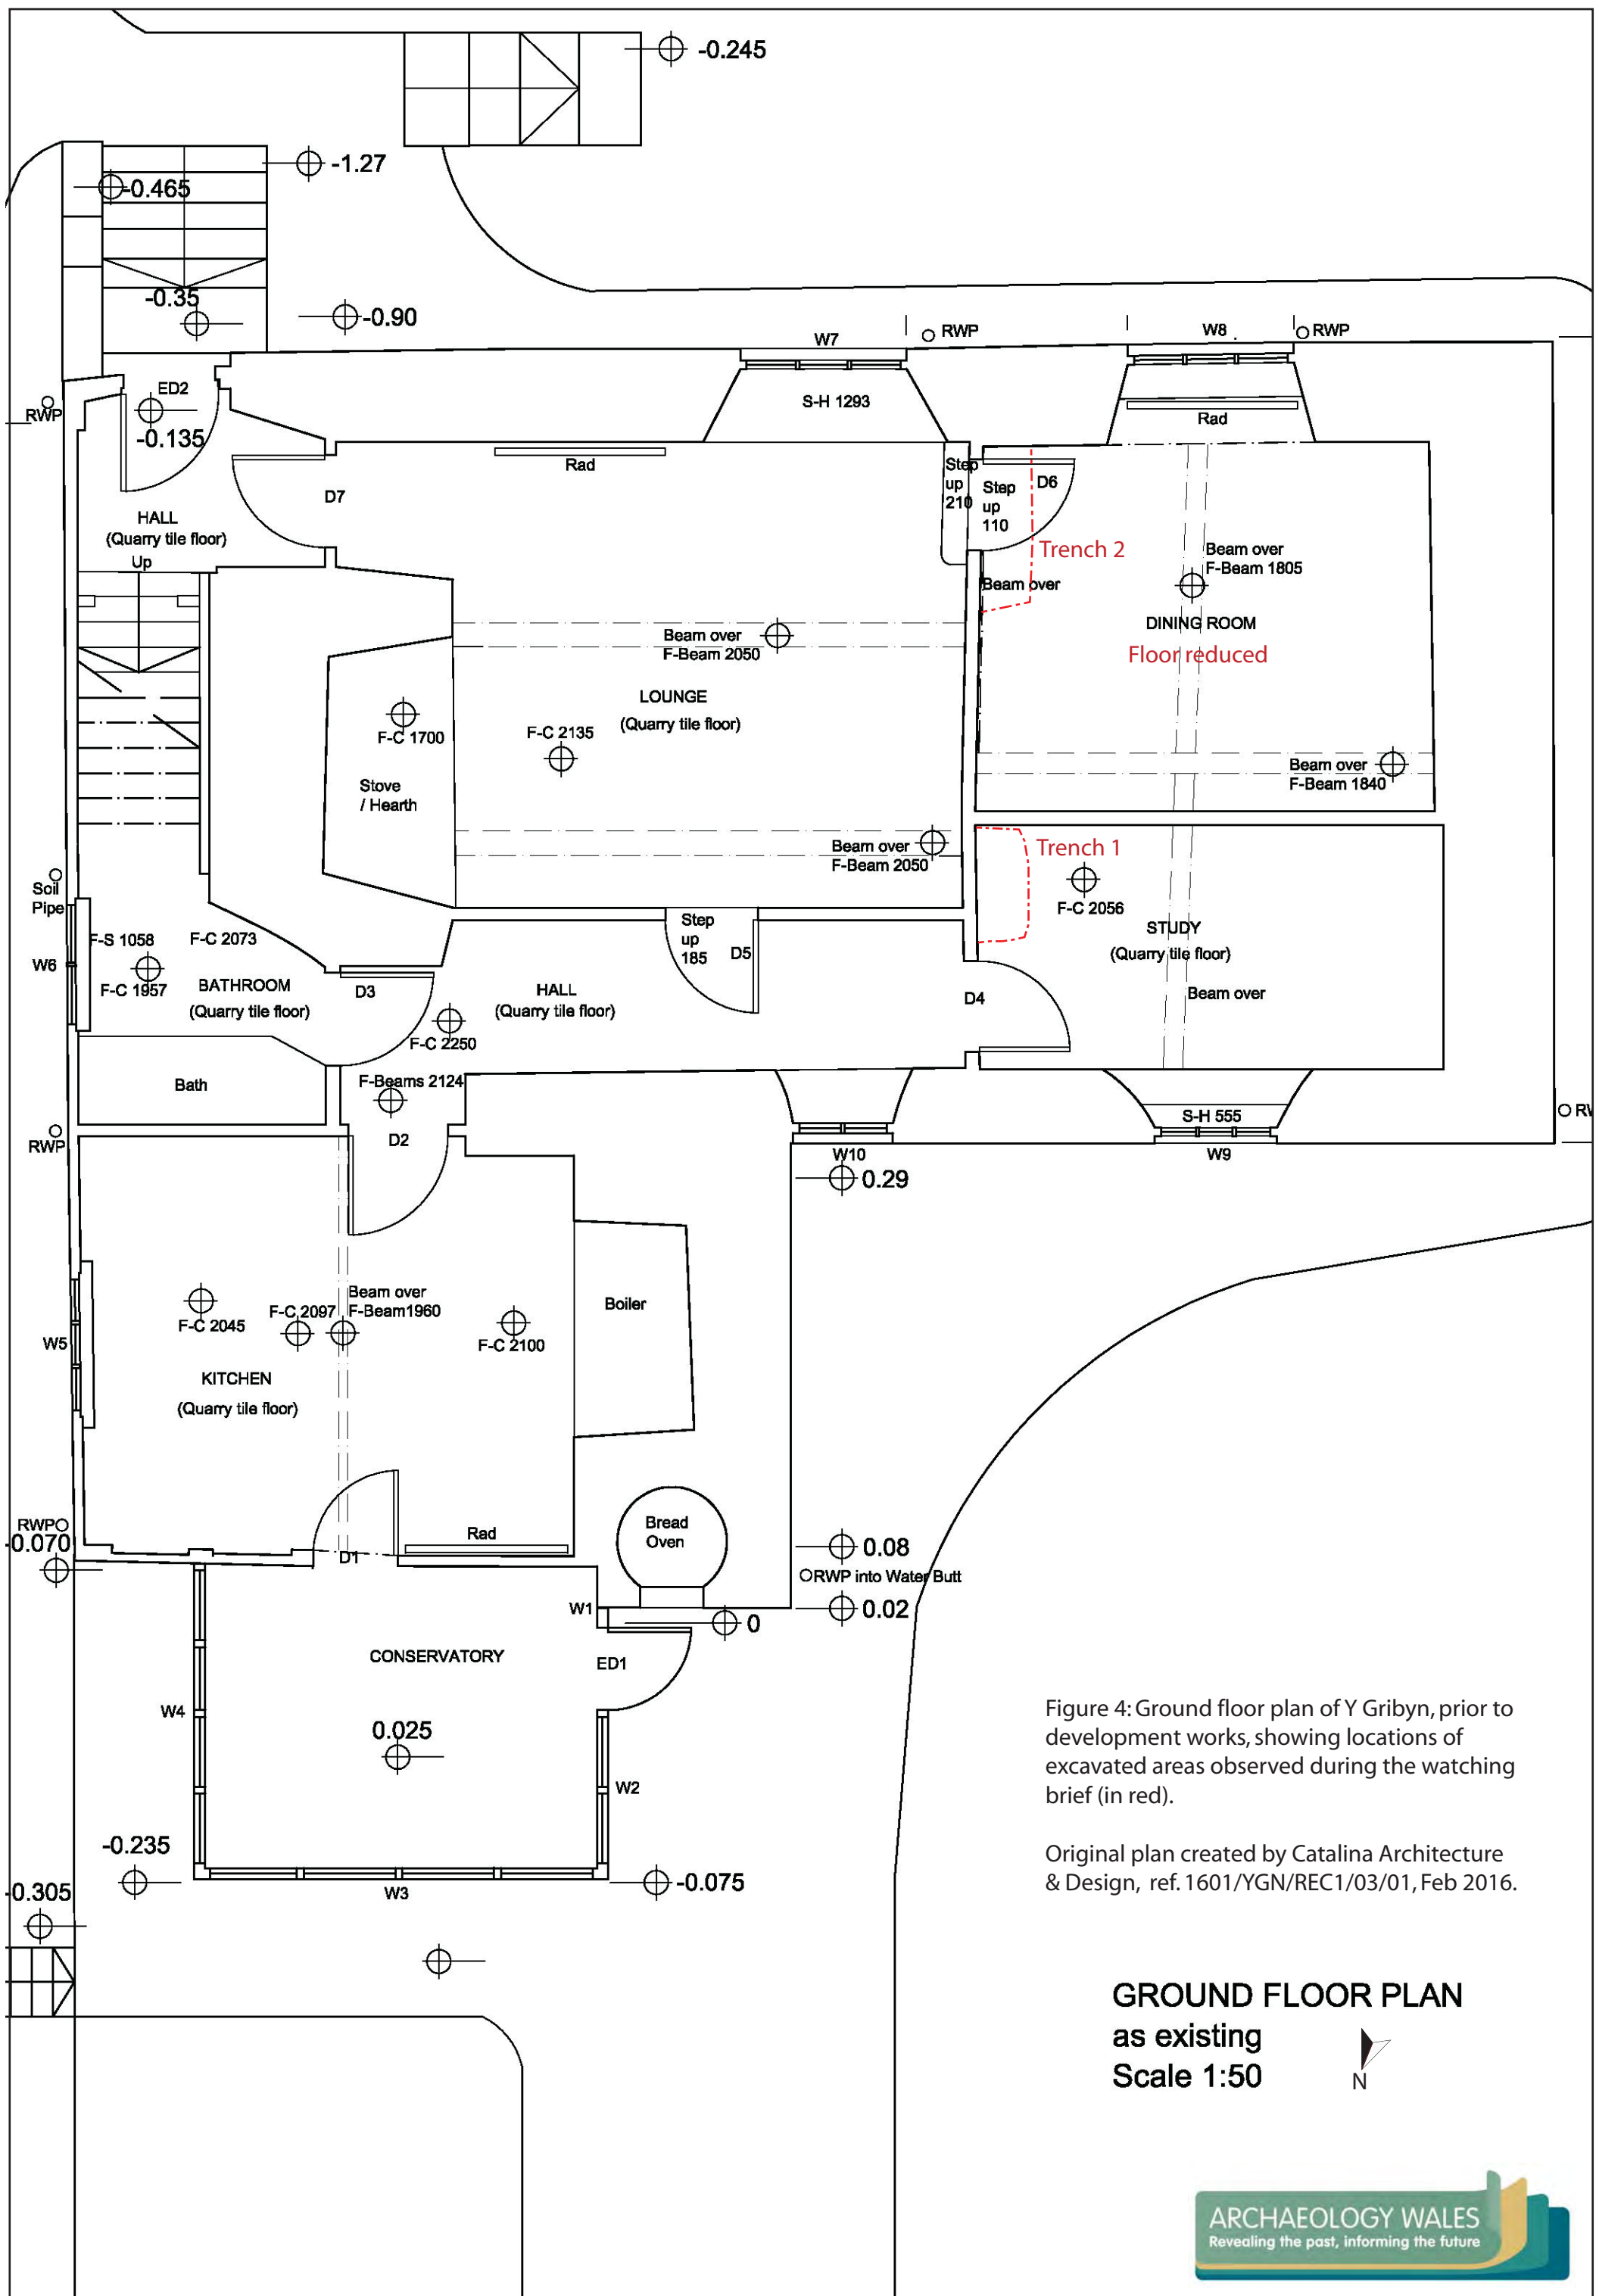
Ground floor plan of Y Gribyn, prior to development works, showing locations of excavated areas observed during the watching brief (in red).
